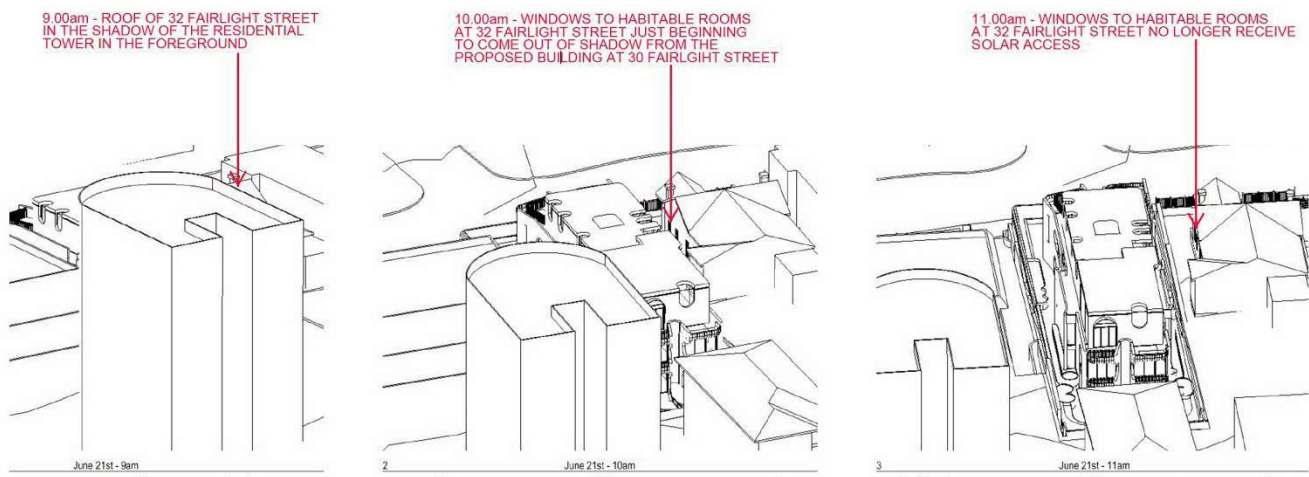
Solar Access impacts on Dwelling at 32 Fairlight Street – Less than 2 hours received
